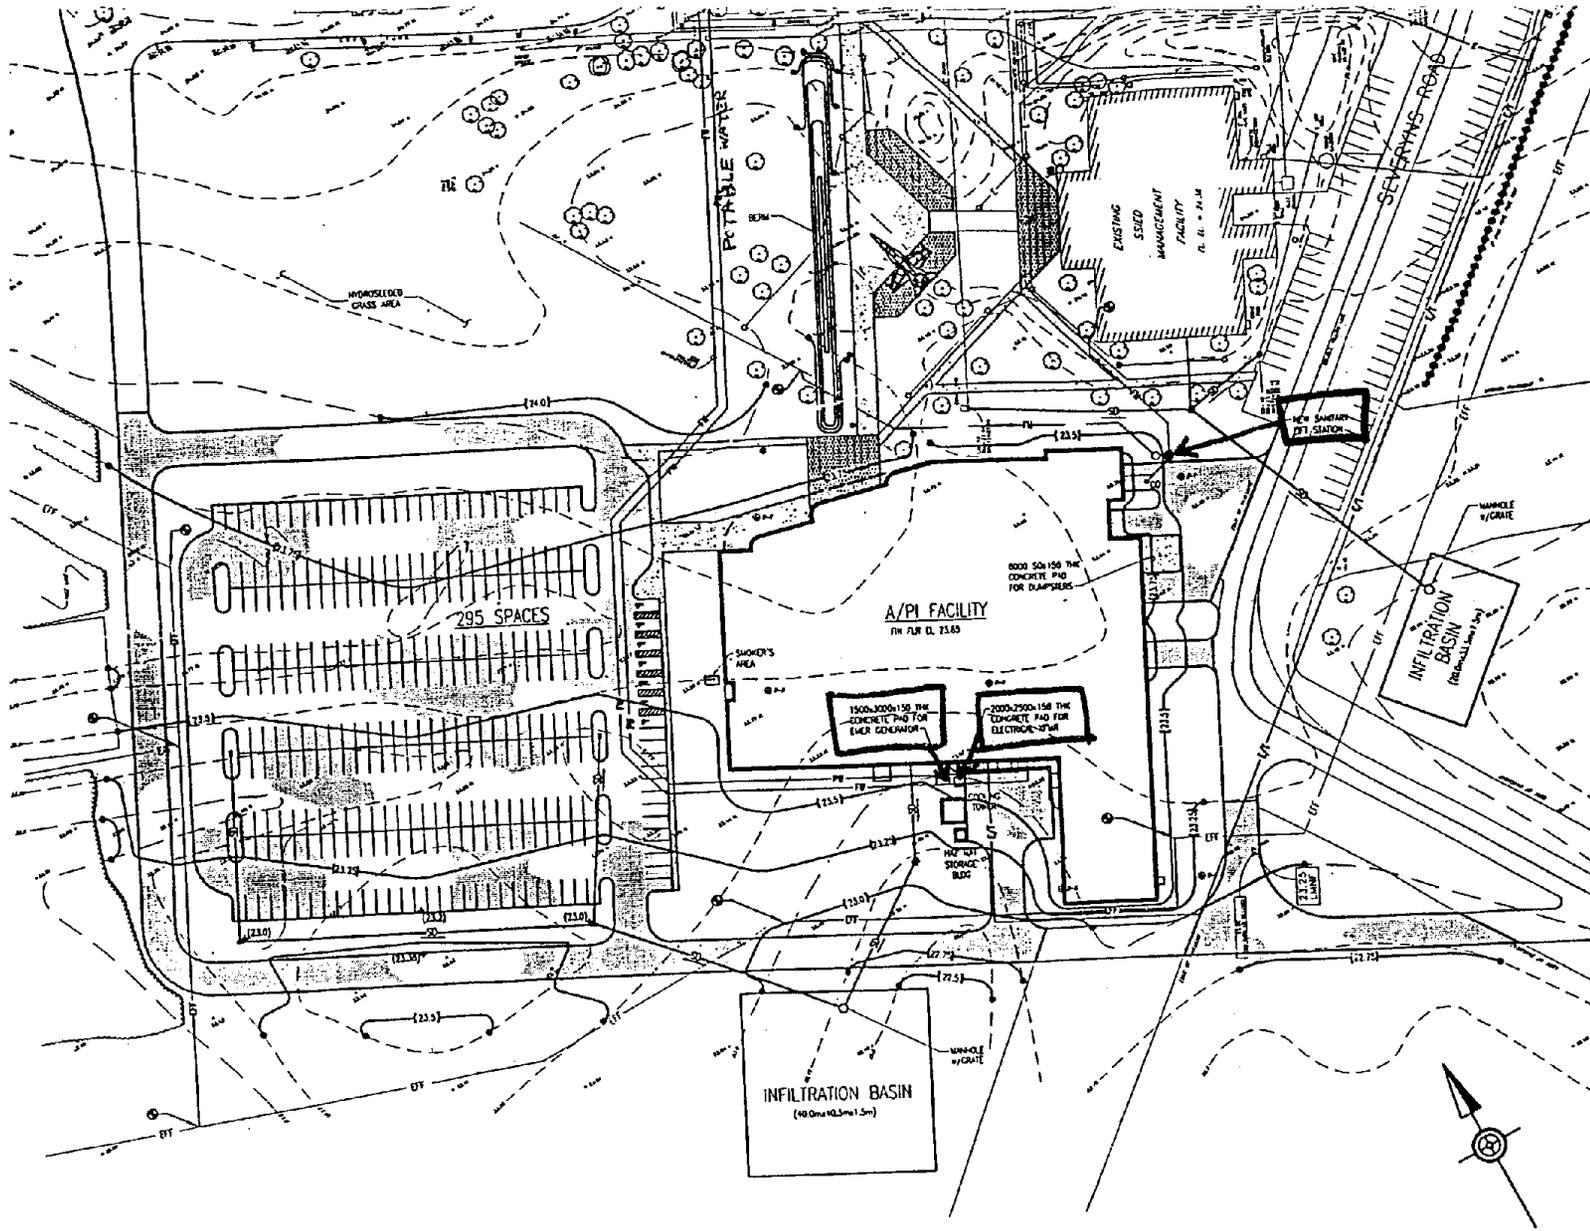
Preferred Alternative, Utility Drawing (Preliminary) SITE PLAN
